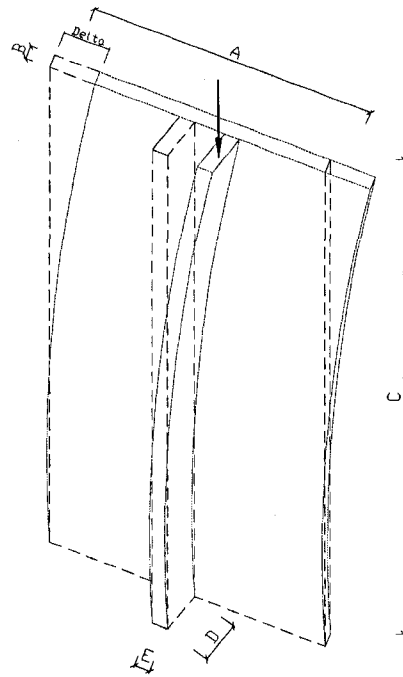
lateral deflection in the wall strip due to earthquake load.
